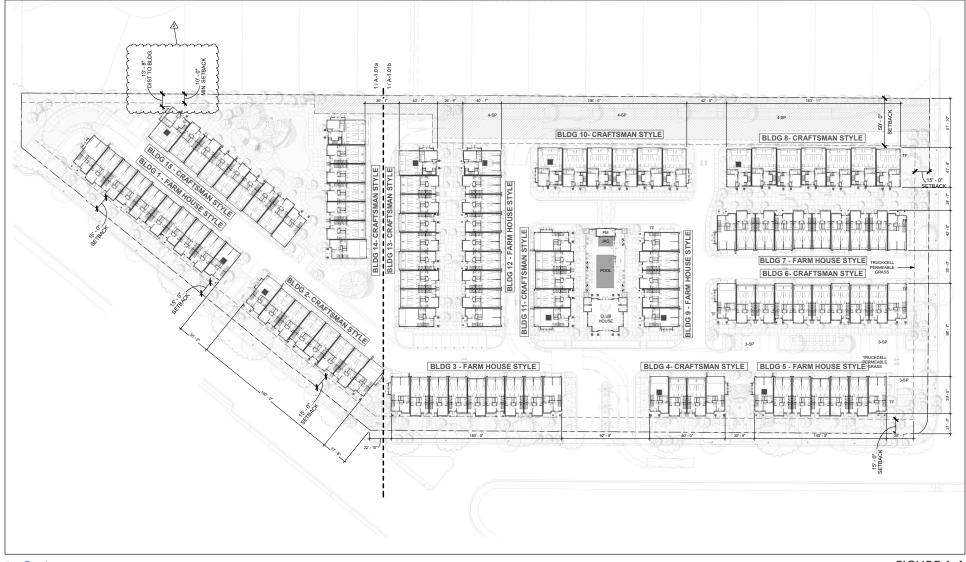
depicts the overall proposed conceptual site plan for the proposed project. Figure 1-5 depicts the typical site cross sections and showcase elevations for proposed two- and three-story buildings, and the proposed conceptual landscape plan is shown in Figure 1-6.
